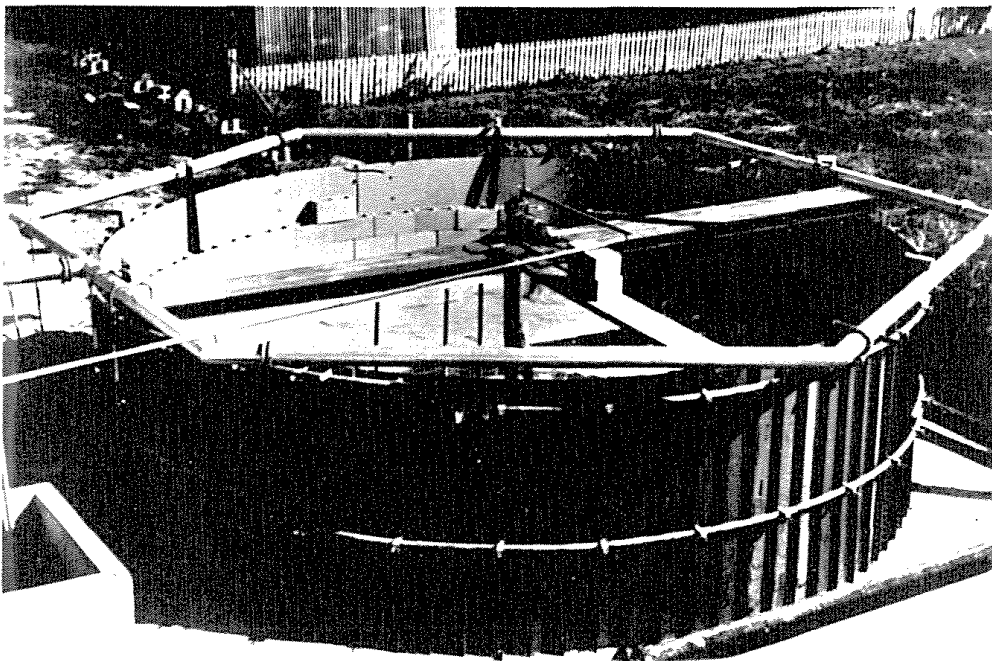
VIEW OF TANK SHOWING INLET ARRANGEMENT
